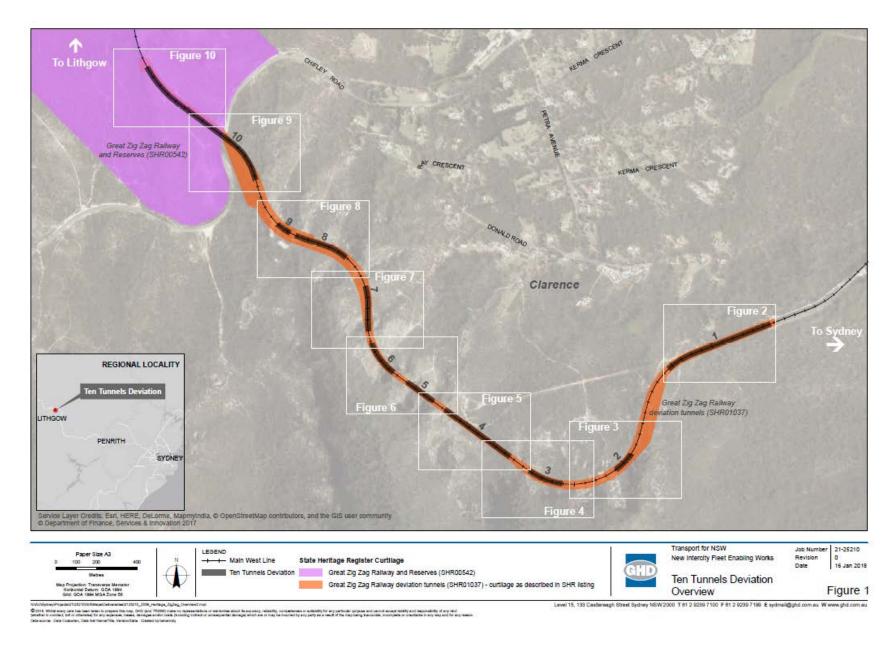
Overview plan showing tunnel locations (GHD Great Zig Zag Railway deviation tunnels Heritage Design Summary 2018)
